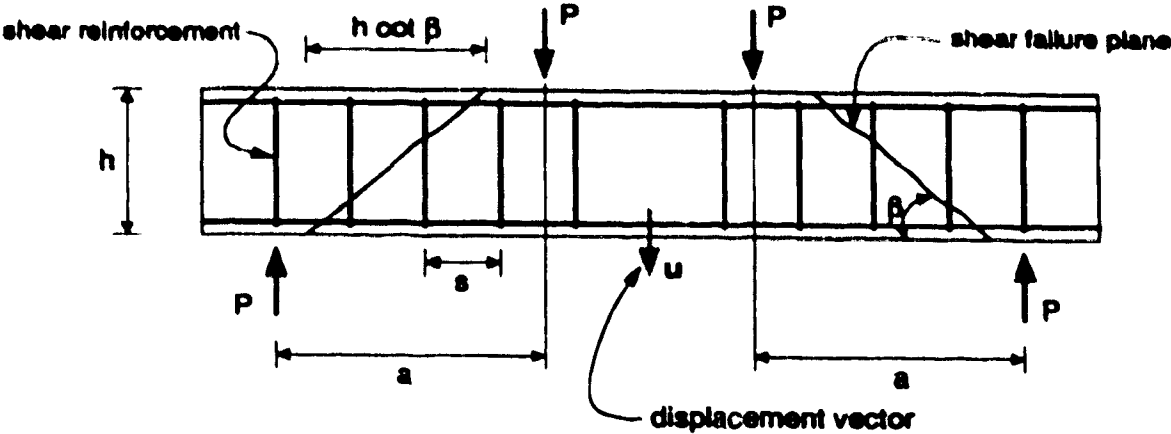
Upper Bound Failure Mechanism for a Reinforced Concrete Beam
